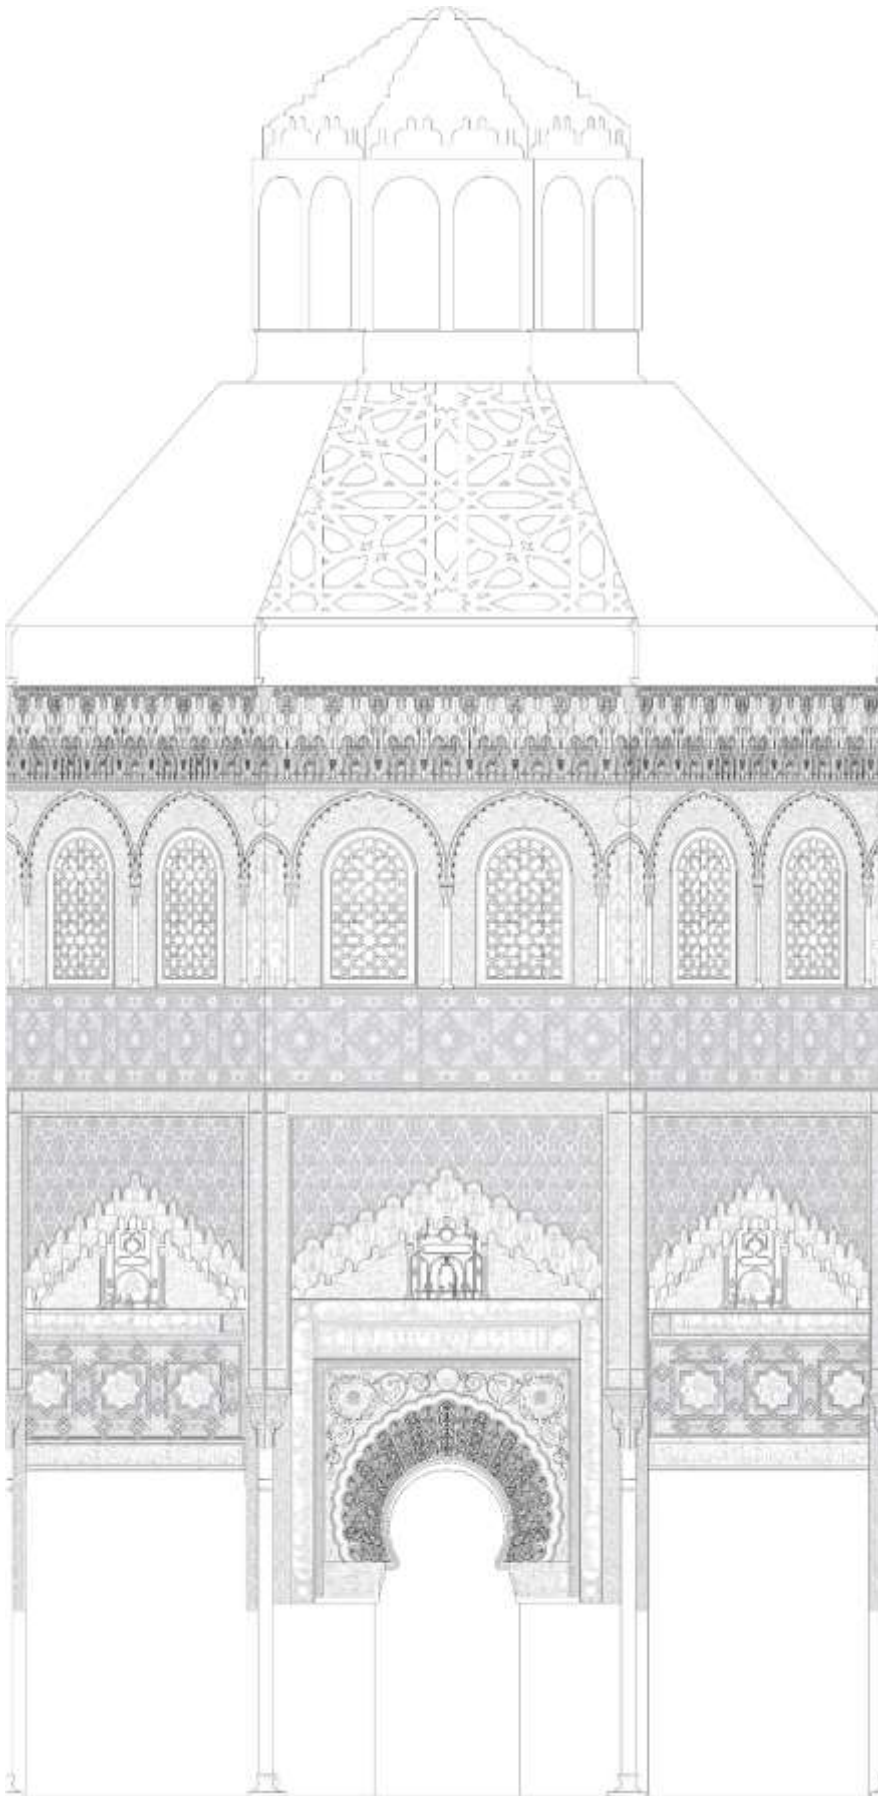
Qibla wall-Mihrab niche (southeast wall)
